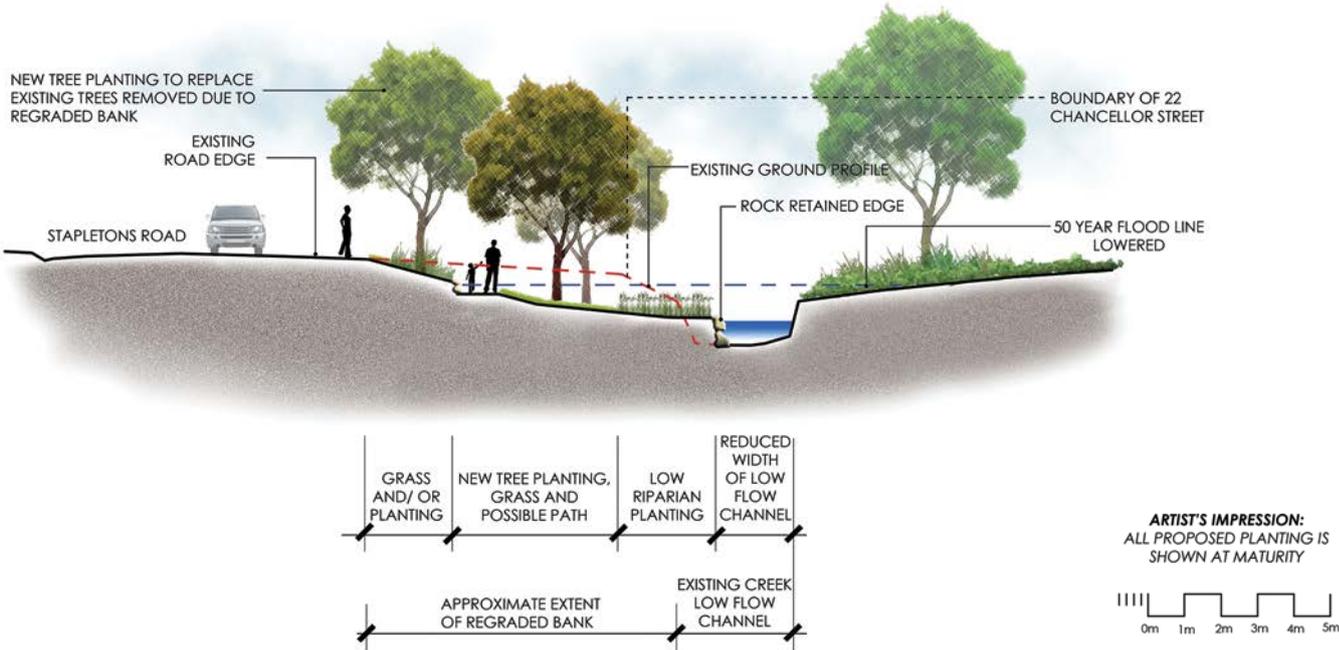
Downstream Option C – Cross Section B (looking downstream from 73 Stapletons Road)
